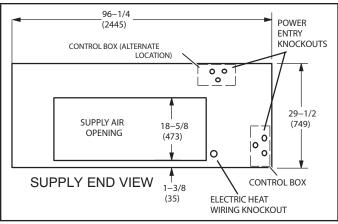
TAA 180 and 240 Knockout Location – Dimensions – inches (mm)
